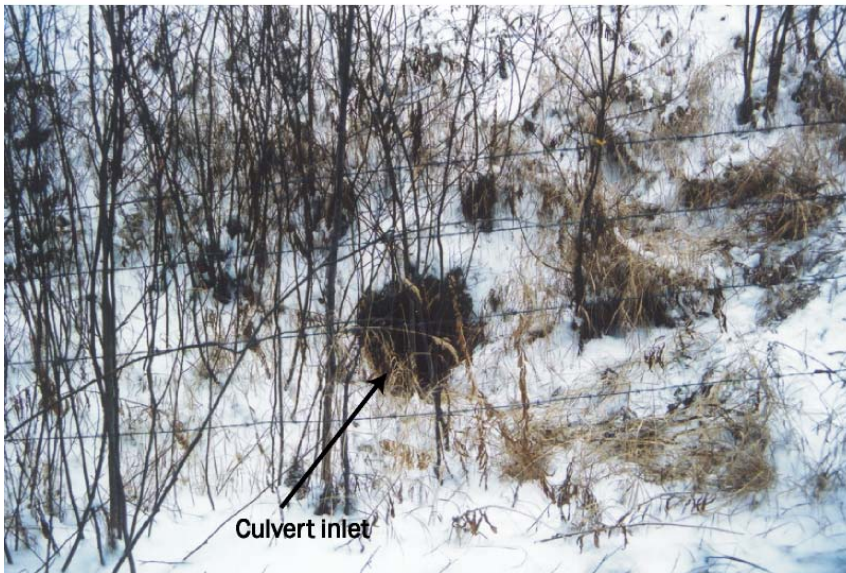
Ditchline is unstable on downstream side of road (resulting from poor drainage and soil saturation (November 12/2002).
